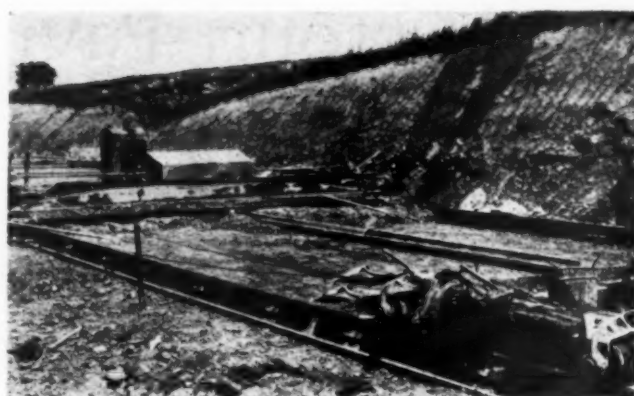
Cables From Strike Off Run Through Sheaves Attached to Subgrader
